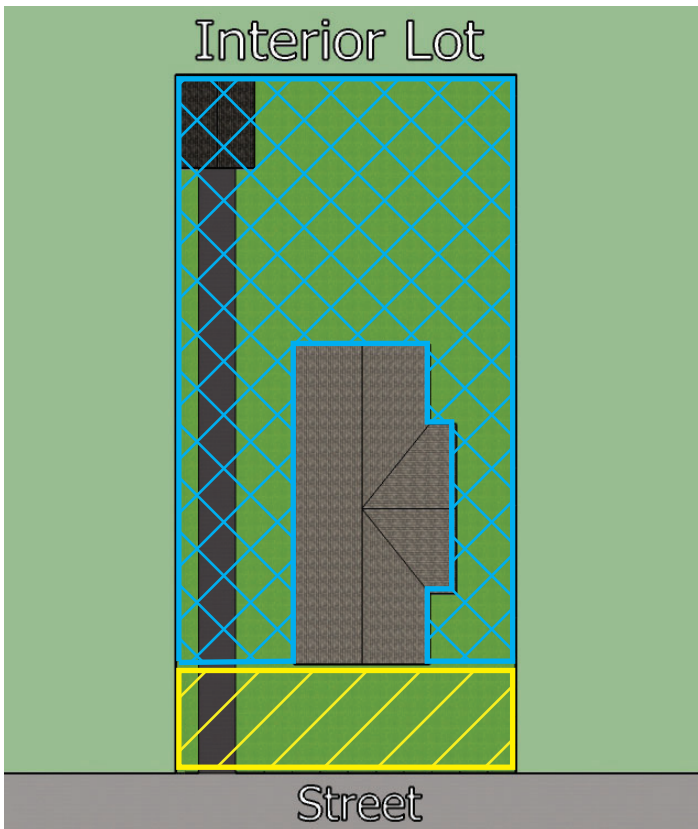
Any timber retaining walls located in the front of an interior lot (area shaded yellow) would require a CoA and any located to the rear of the facade (area hatched blue) would require an ACoA.
